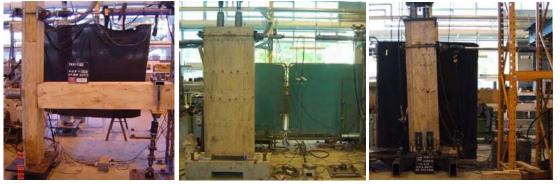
Test set-up of exterior beam-column joint, (single) cantilever wall, cantilever column specimens.
